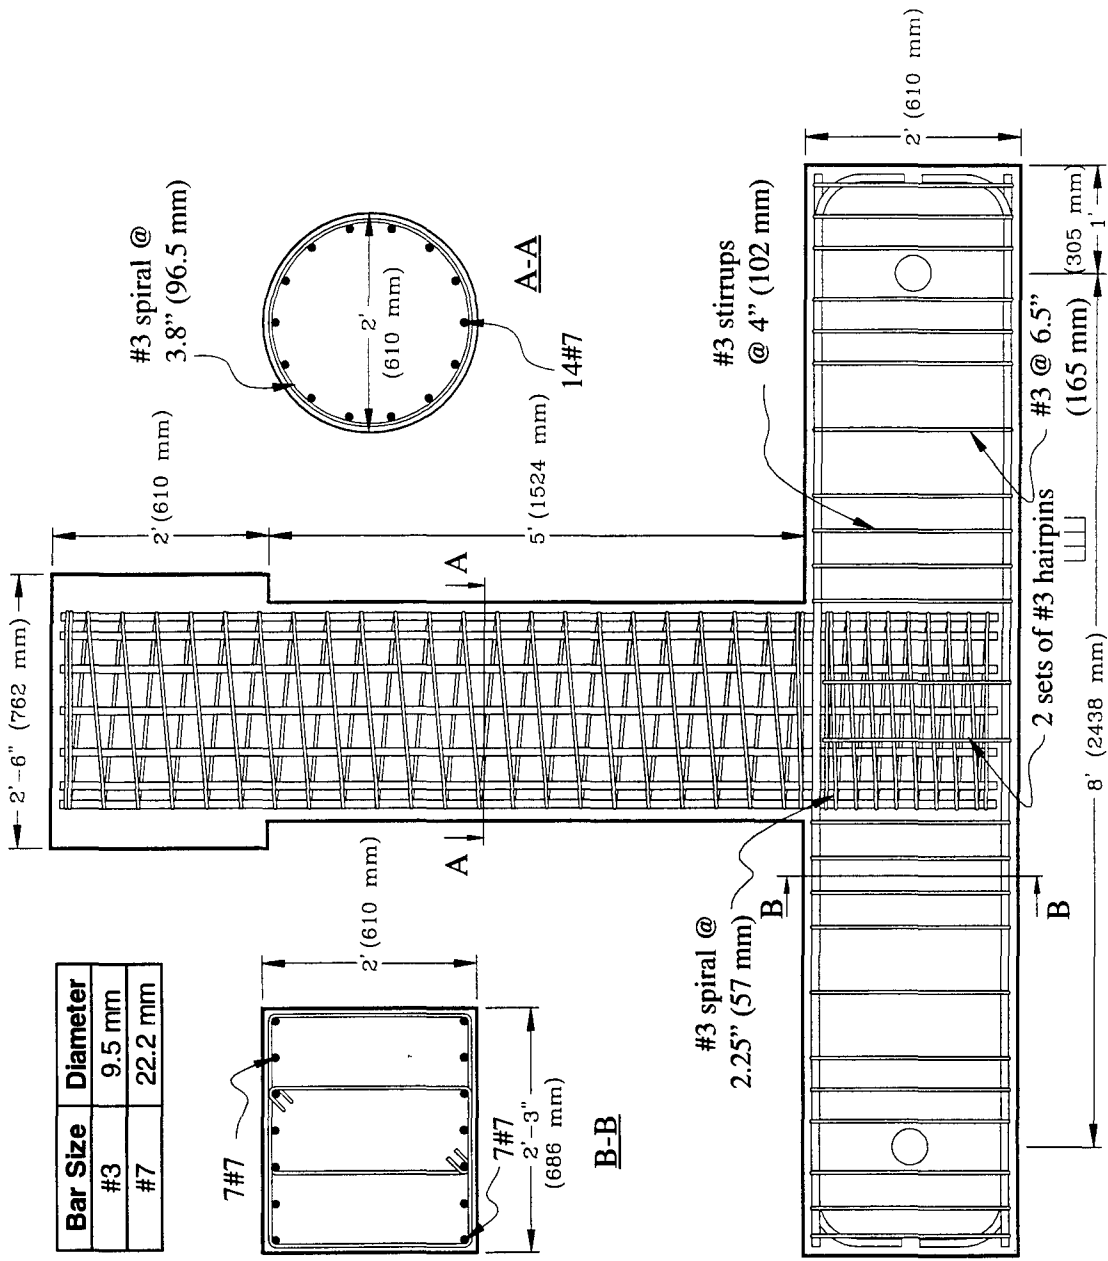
Key reinforcement details of the test unit with a reinforced concrete cap beam.
